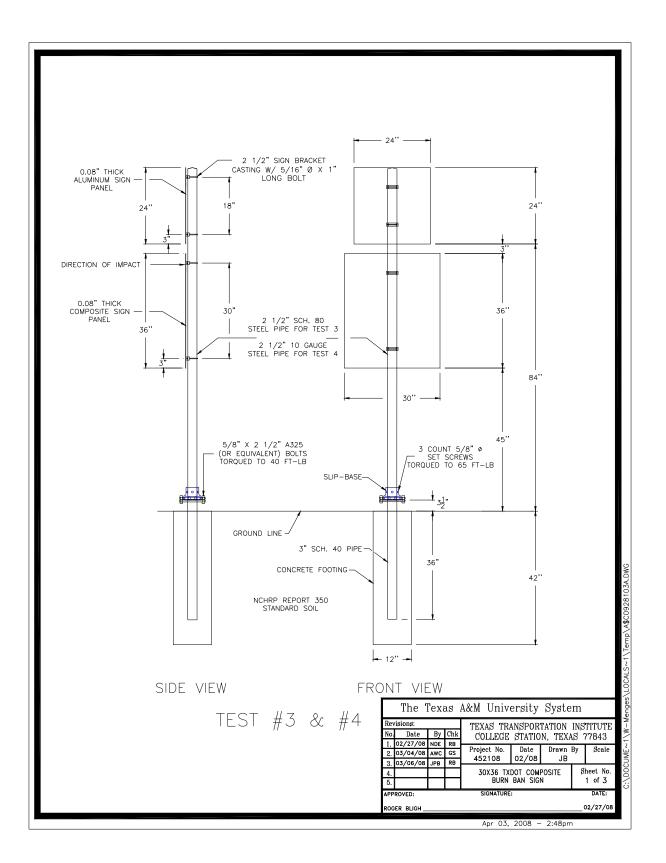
Details of the TxDOT 30 inch × 36 inch Burn Ban Sign Installation.
